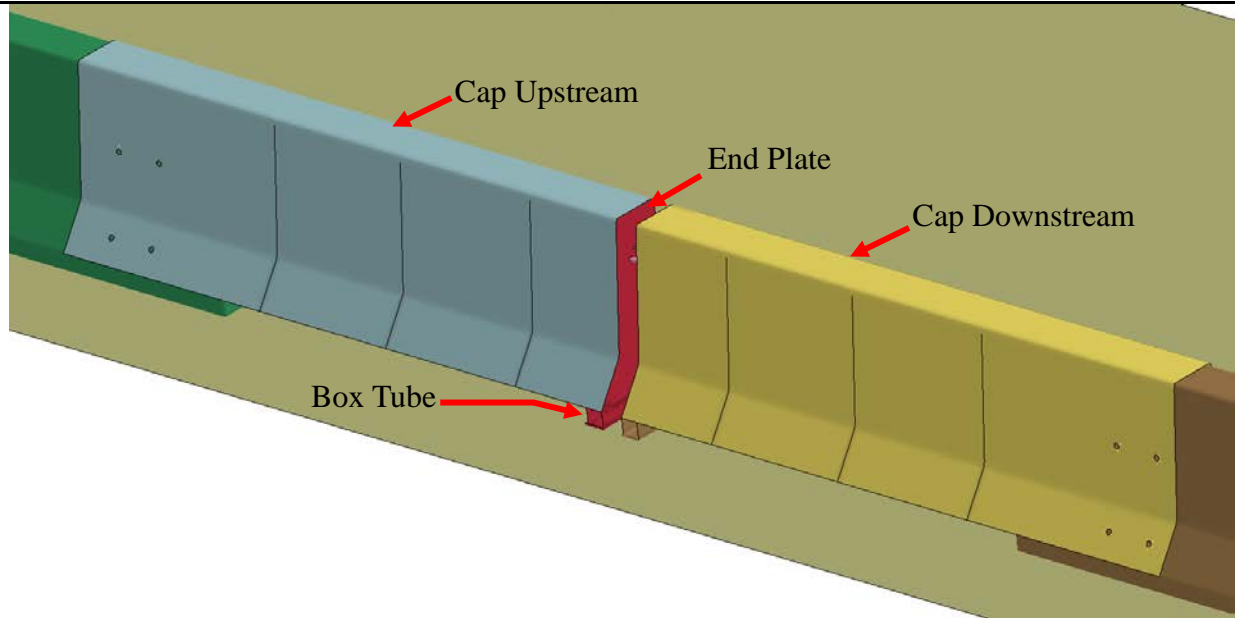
Cover Plate PCB Gap System - Final Prototype Design for 12.5 ft Gap
